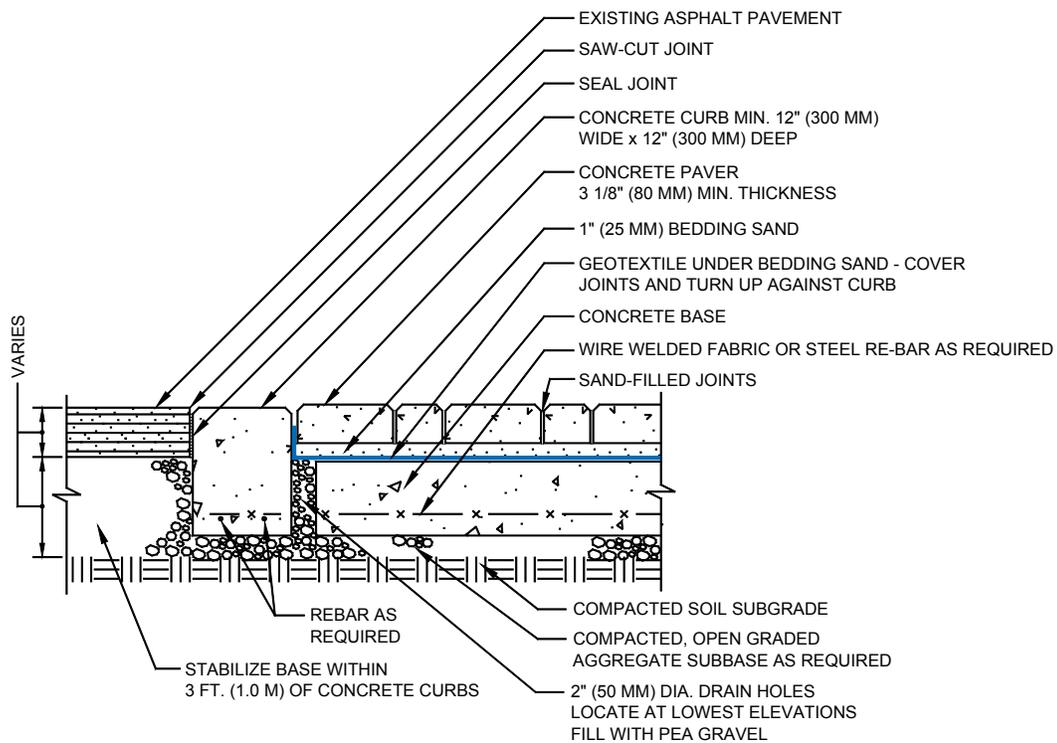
Interlocking concrete pavement overlay on a rigid concrete base
